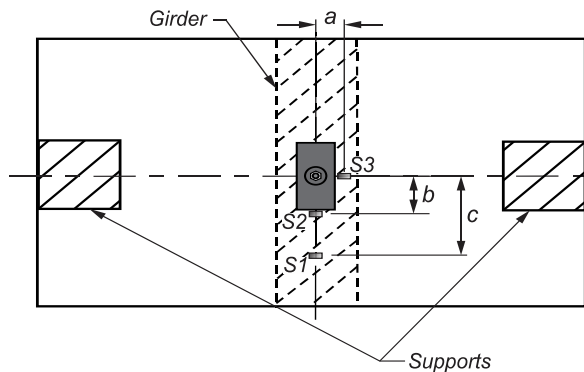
Strain gage locations negative bending tests – wearing surface view
